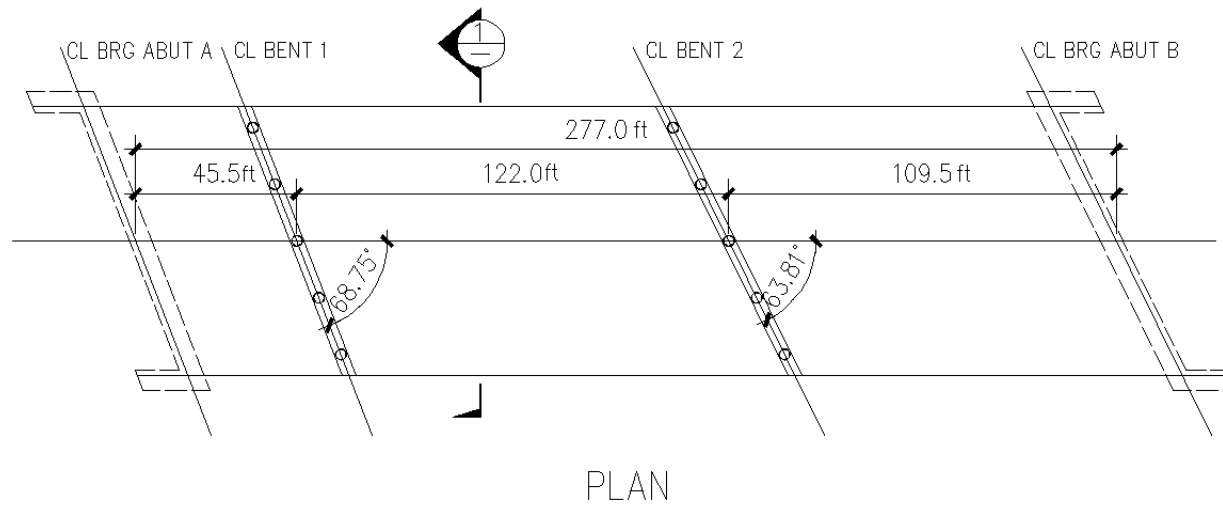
Plan View of Quincy Avenue over I-25 and LRT
